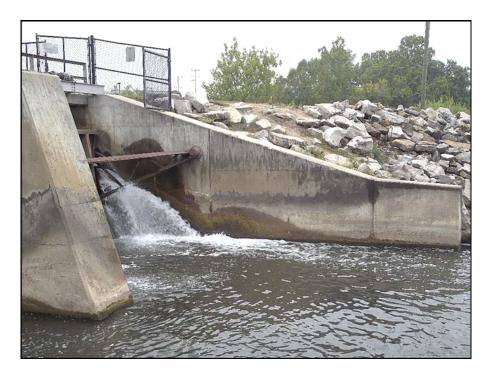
Upstream right abutment wall Note the overgrowth of vegetation and spalled concrete
